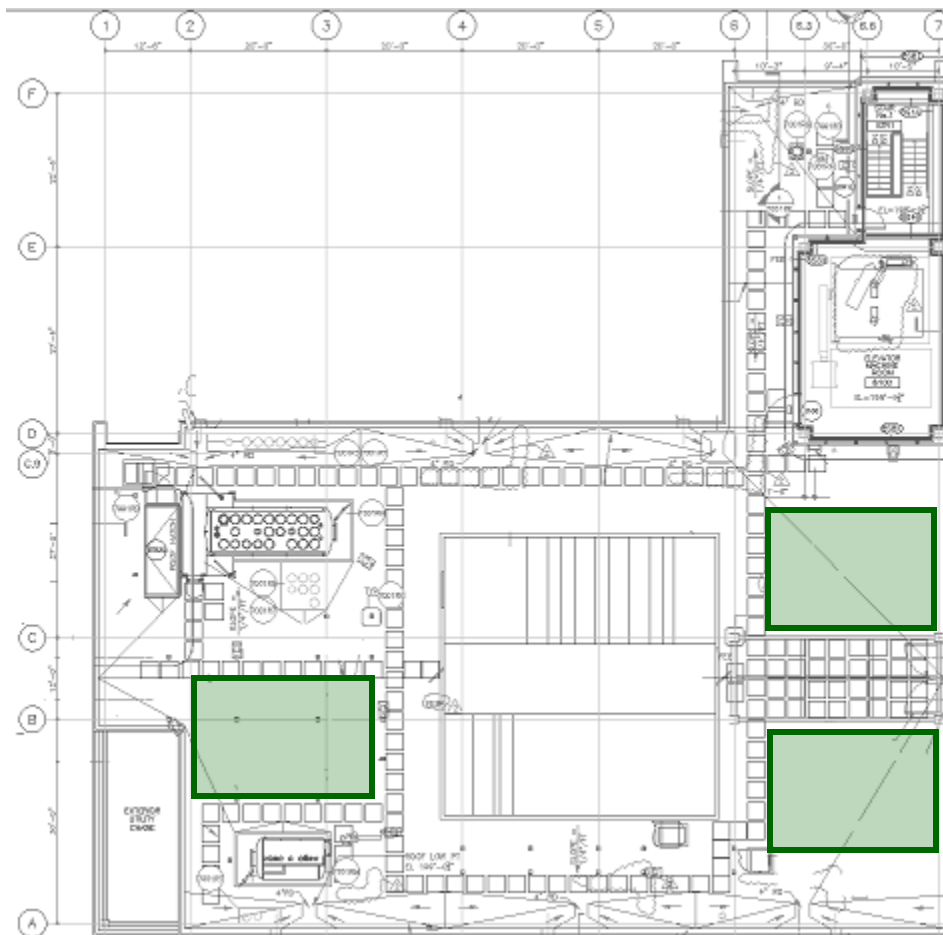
The roof plan. The three green boxes show the three areas of panels.
